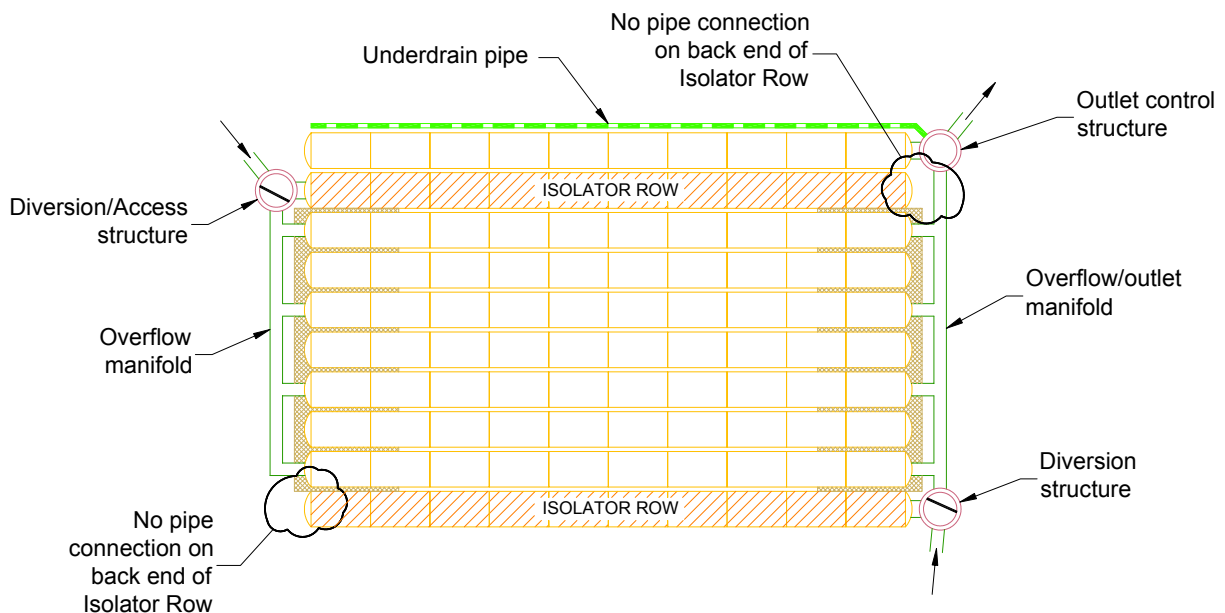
Typical StormTech Chamber Layout with Isolator Row
